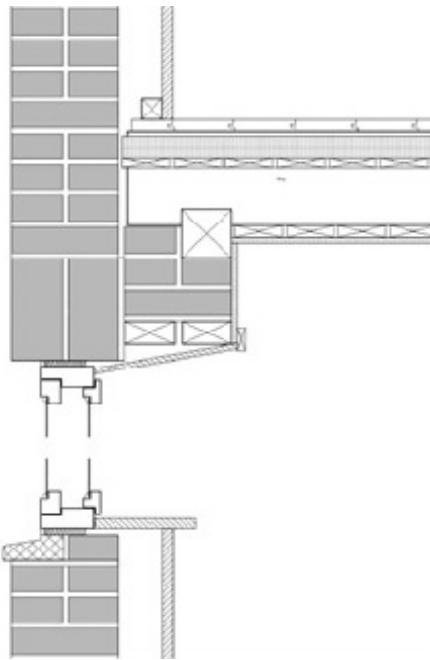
Vertical section of the joint between the loadbearing exterior wall and the horizontal partition at the window wall.
